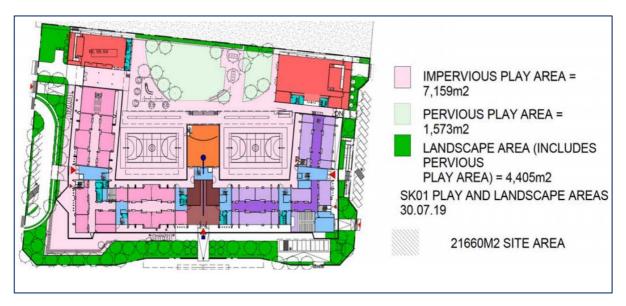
| Proposed site landscaping at project completion (Source: Applicant's Modification Report
